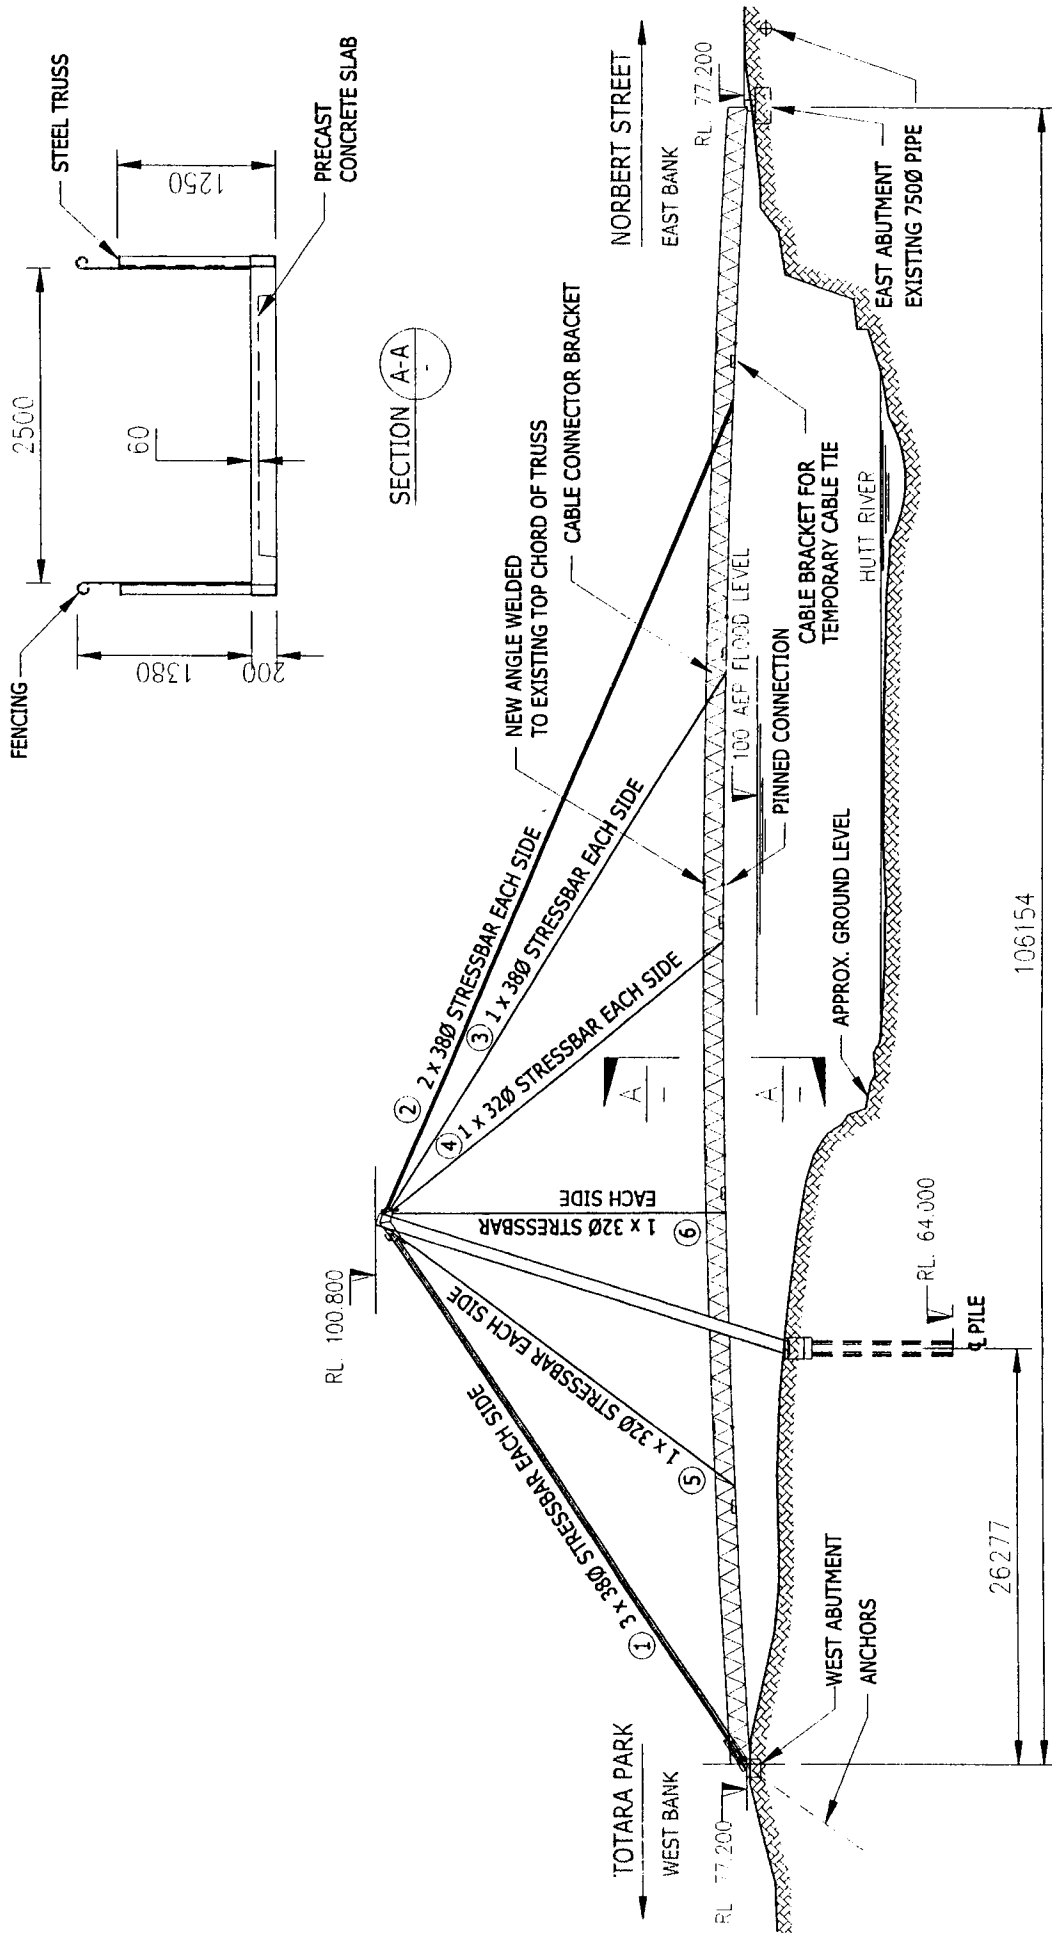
Elevation Of Strengthened Norbert Street Bridge
